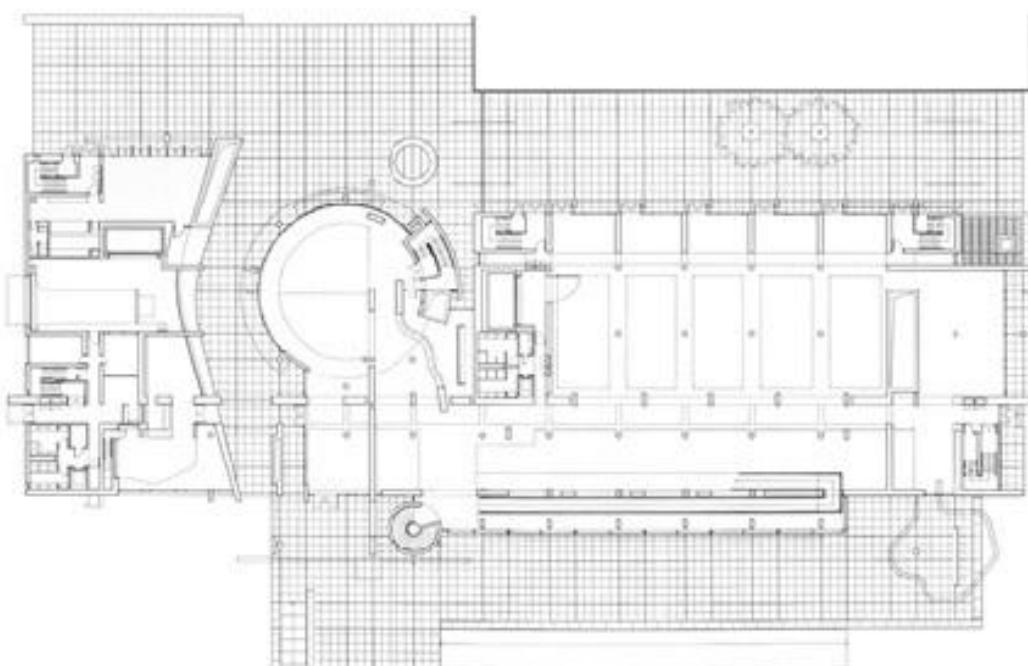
Ground floor plan (Source: Richard Meier's Office)
